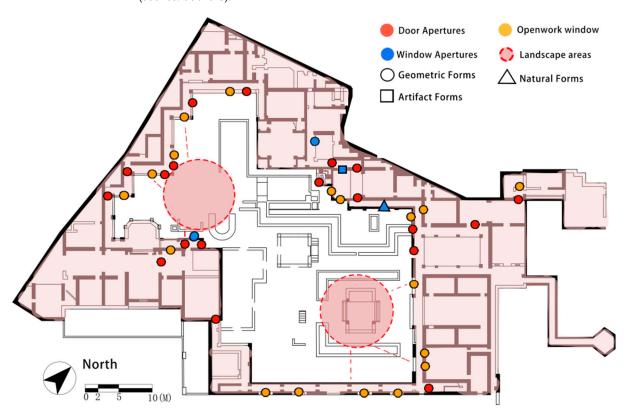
Location and distribution of permeable-type doors and windows in Ke Garden (source: authors).
